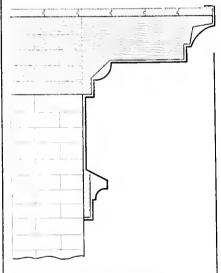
Wooden Lookout Placed on Top of Wall.
